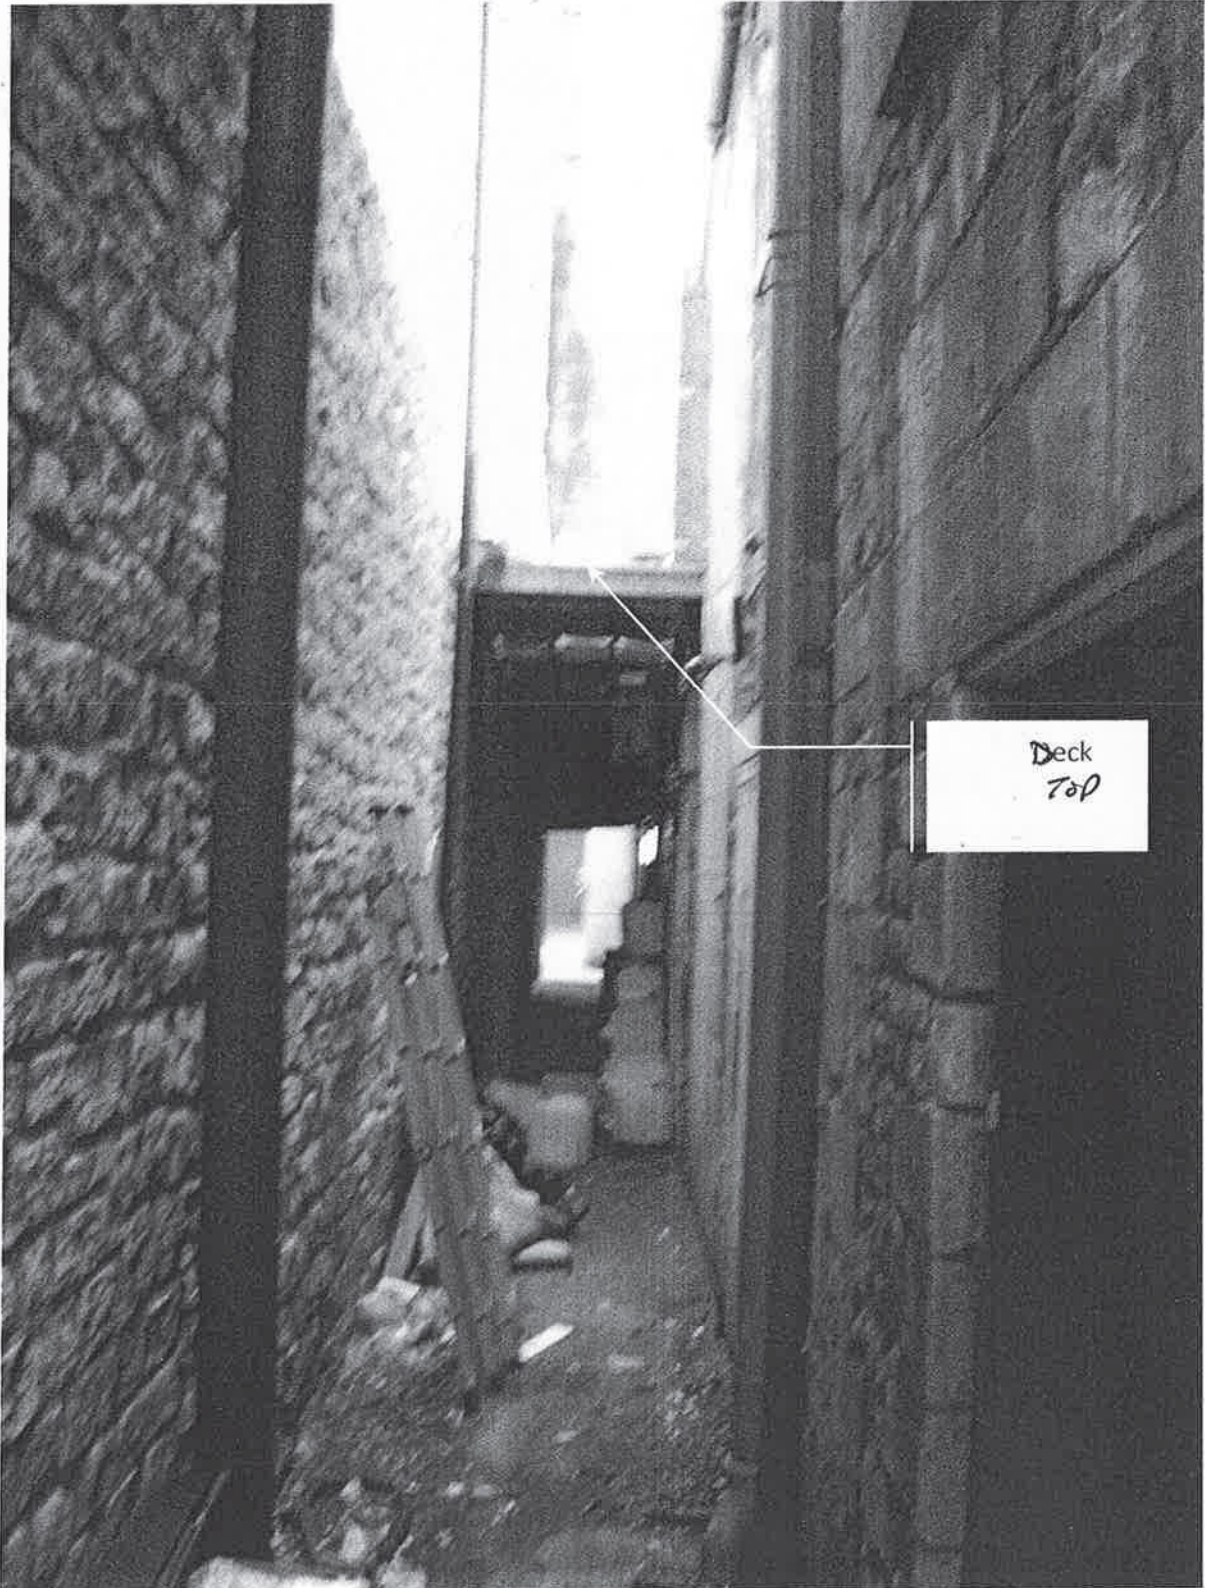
View of deck from alley showing height of IPL perimeter wall above deck
